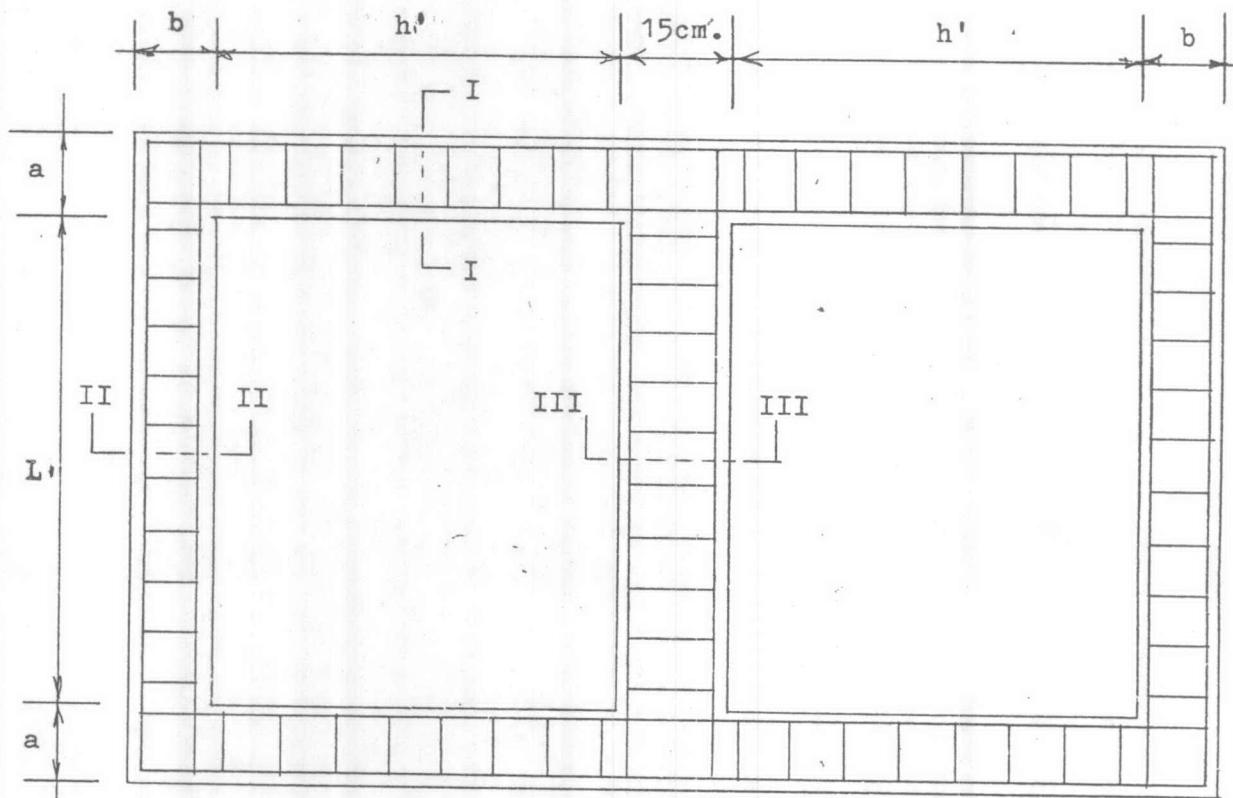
Details of reinforcement of tested frame (Ref. 2)
